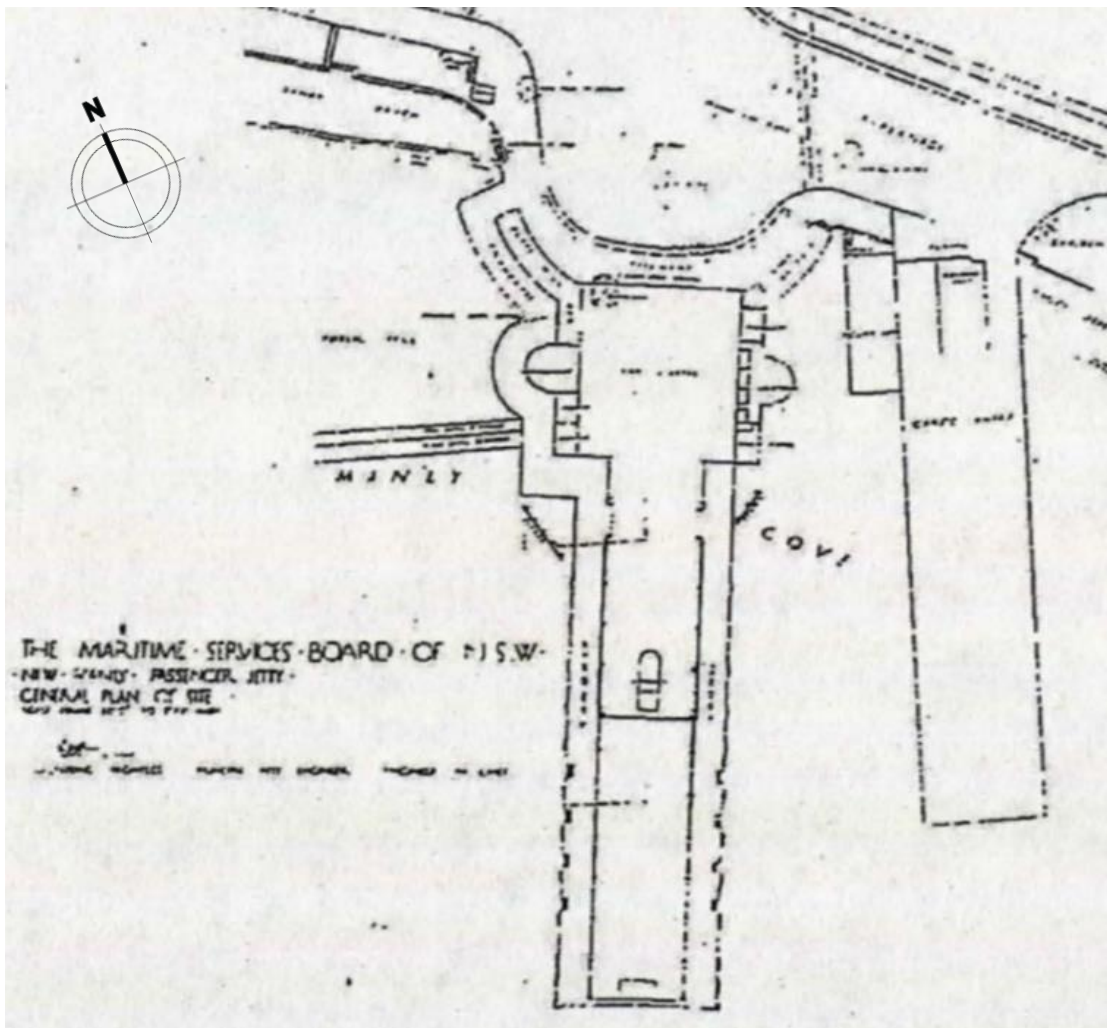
Detail Floor Plan of Manly Ferry Wharf 1 and 2 with the Fun Pier visible to the east of the New Passenger Jetty (NTS). Plan dated, 1940. Source: MSB Plan No. K1/130.
